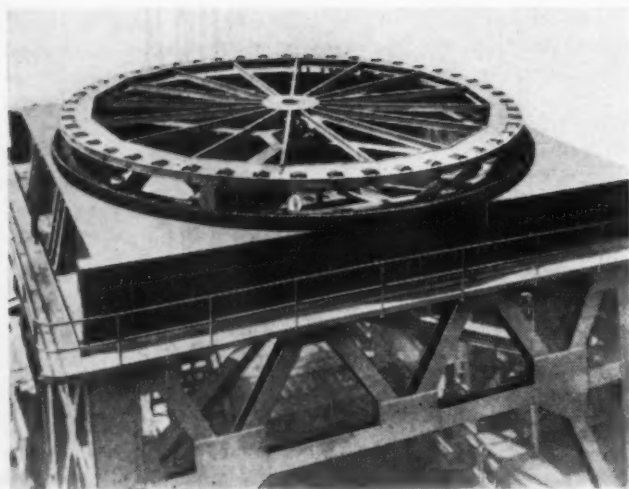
ROLLER-BEARING CIRCLE, ASSEMBLED AND READY FOR INSTALLATION
